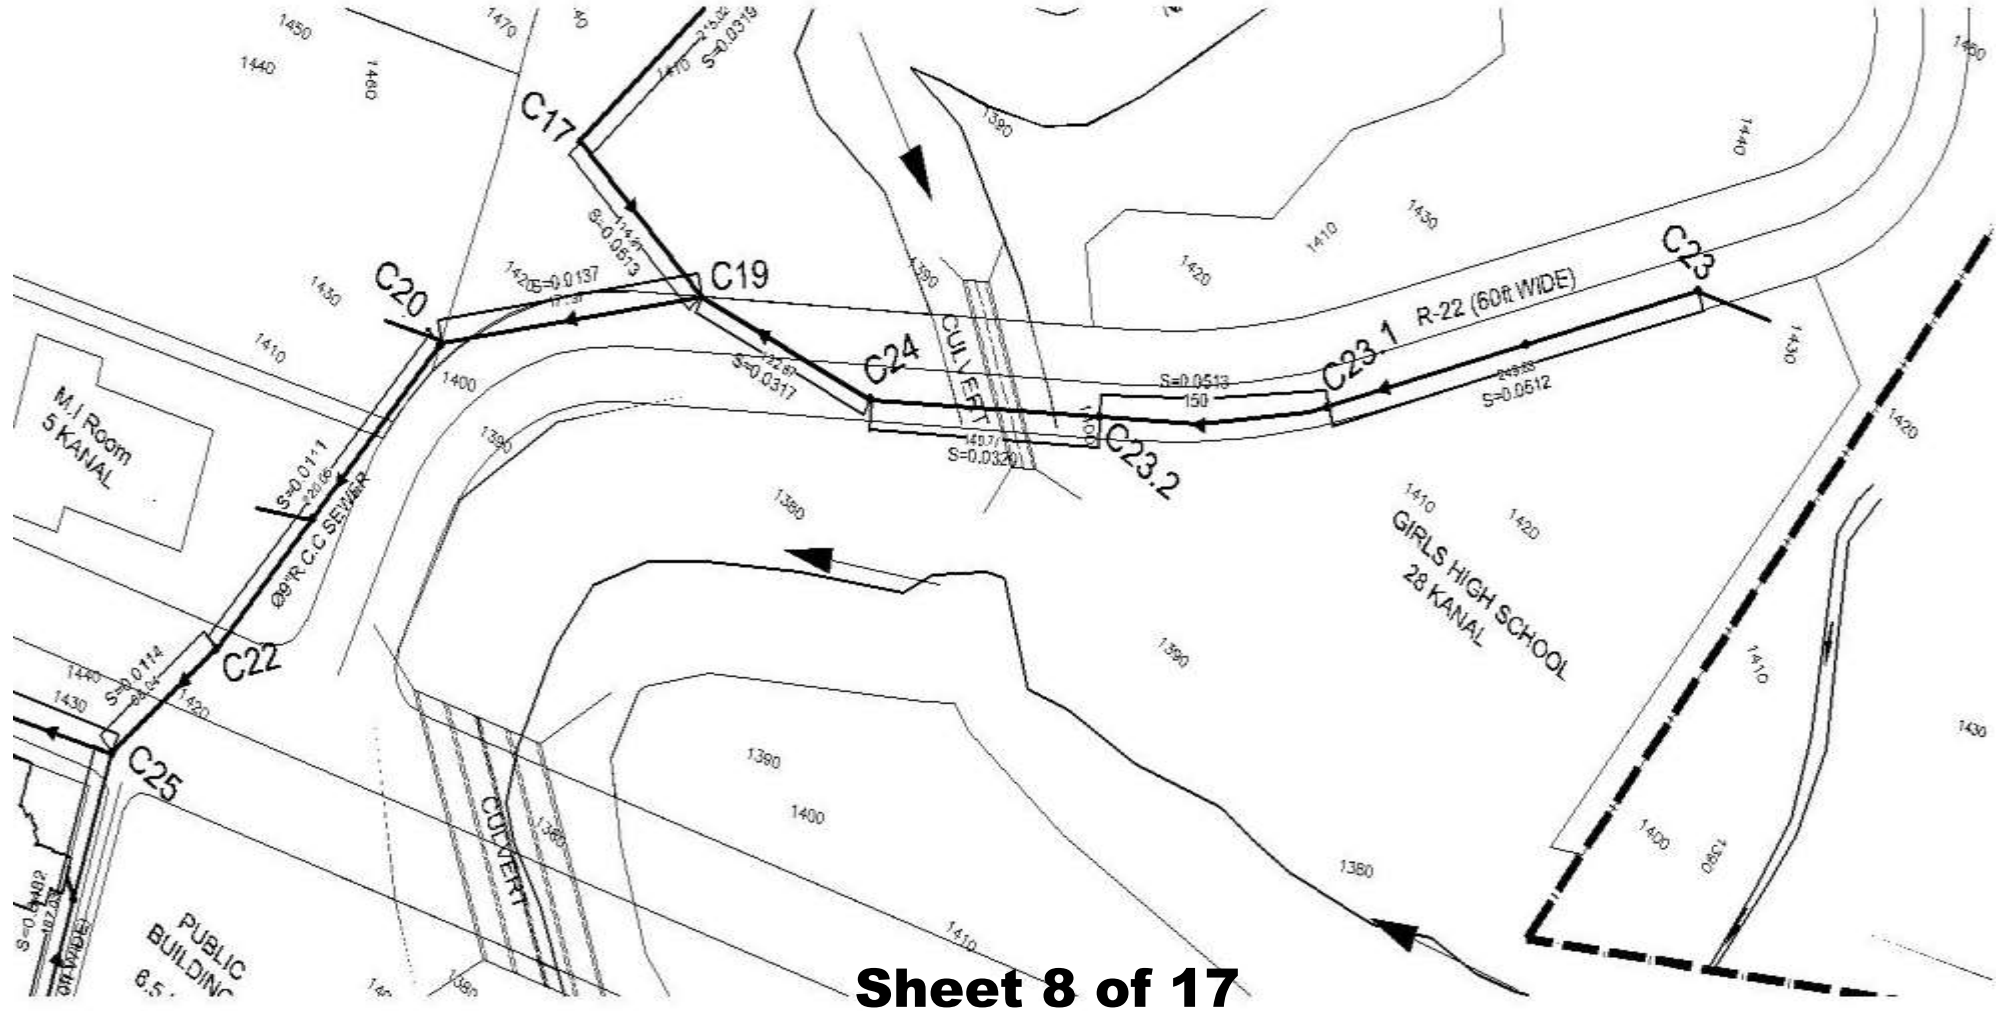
Sewer layout plan of Zone-3 at L/S of MR-01 showing nodes and flow direction
